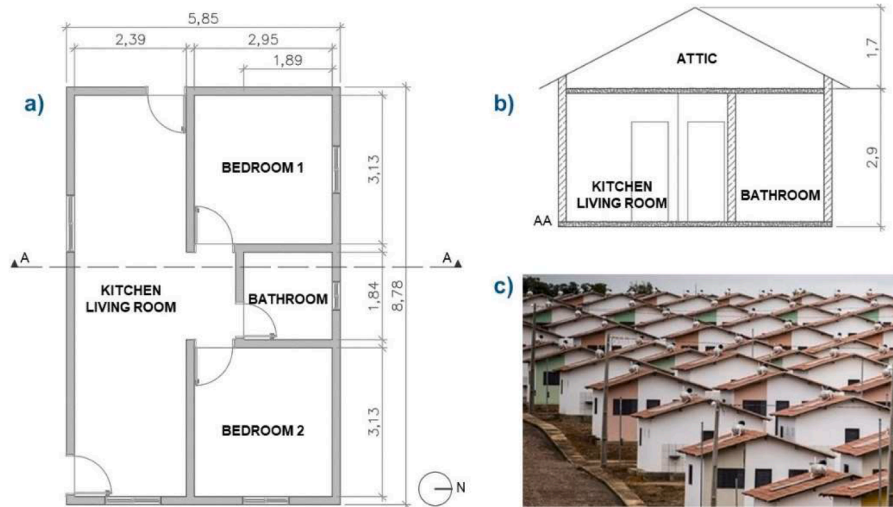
a) Floor Plan; b) Cross-section; c) typical houses built in the MCMV program.
